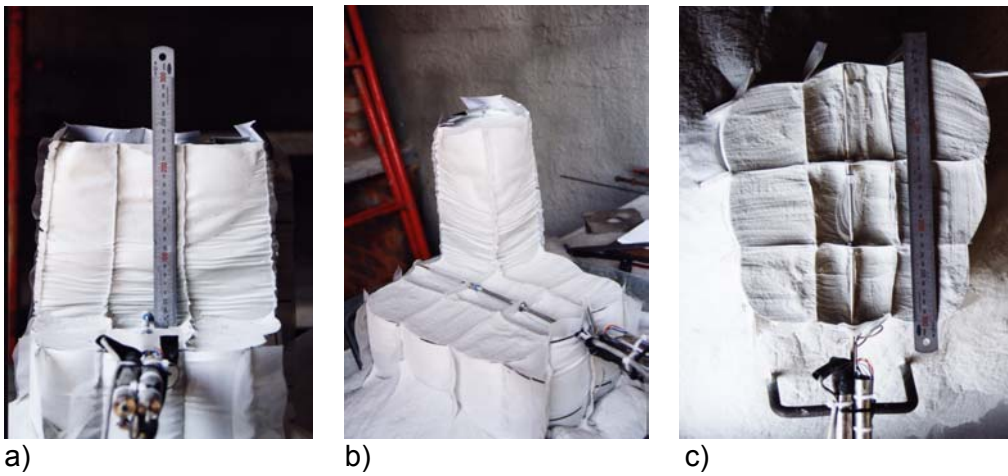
Internal geometry of the 3x3 pack after tests.
